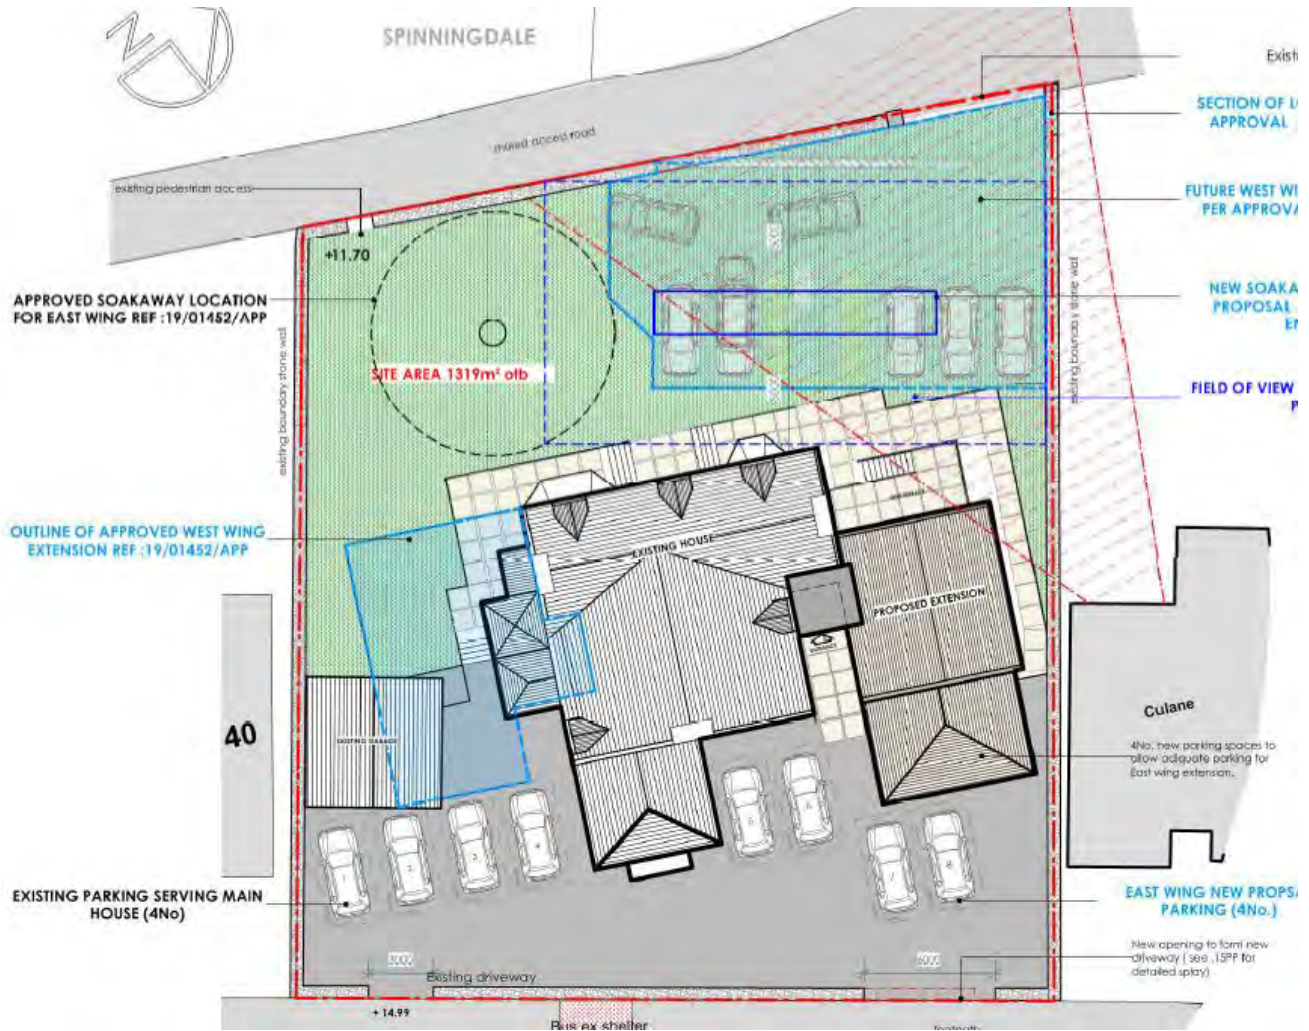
REVISED SITE PLAN SHOWING NEIGHBOURS VISIBILITY PROTECTED
